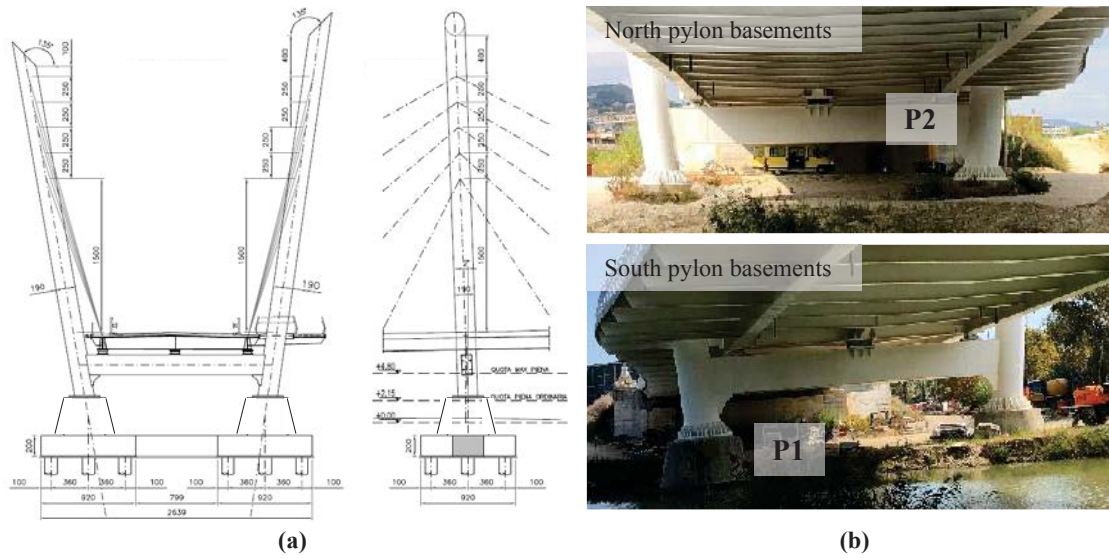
Pylon foundation systems: (a) schematic layout, (b) north and south basement pictures.
